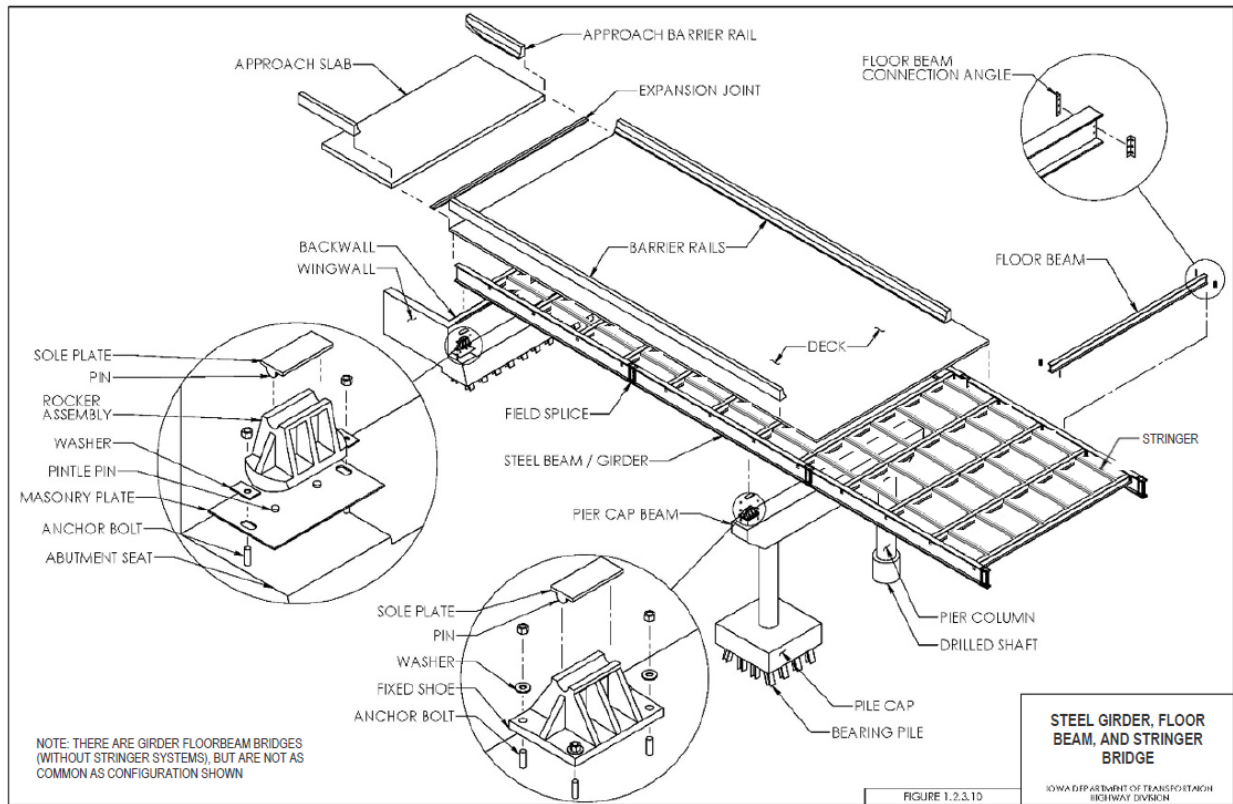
Two Girder, Floorbeam and Stringer System Components
